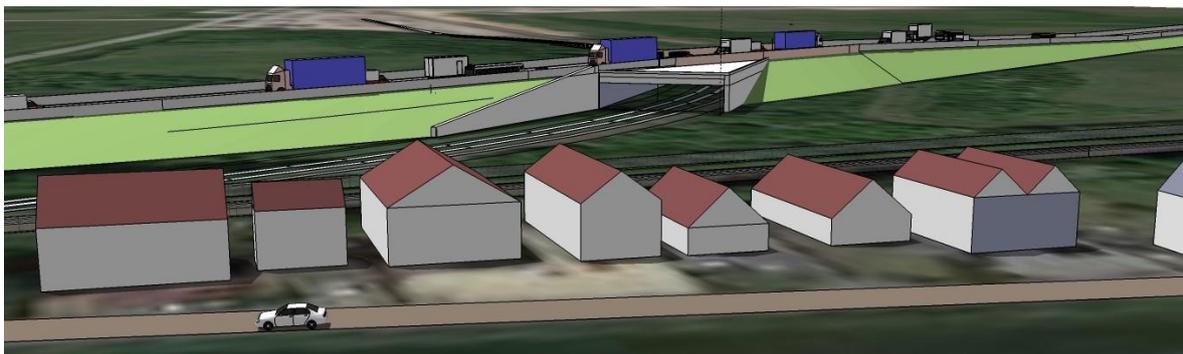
Modelled Image of the proposed Appleford rail sidings bridge overlooking dwelling in Main Road Appleford.
